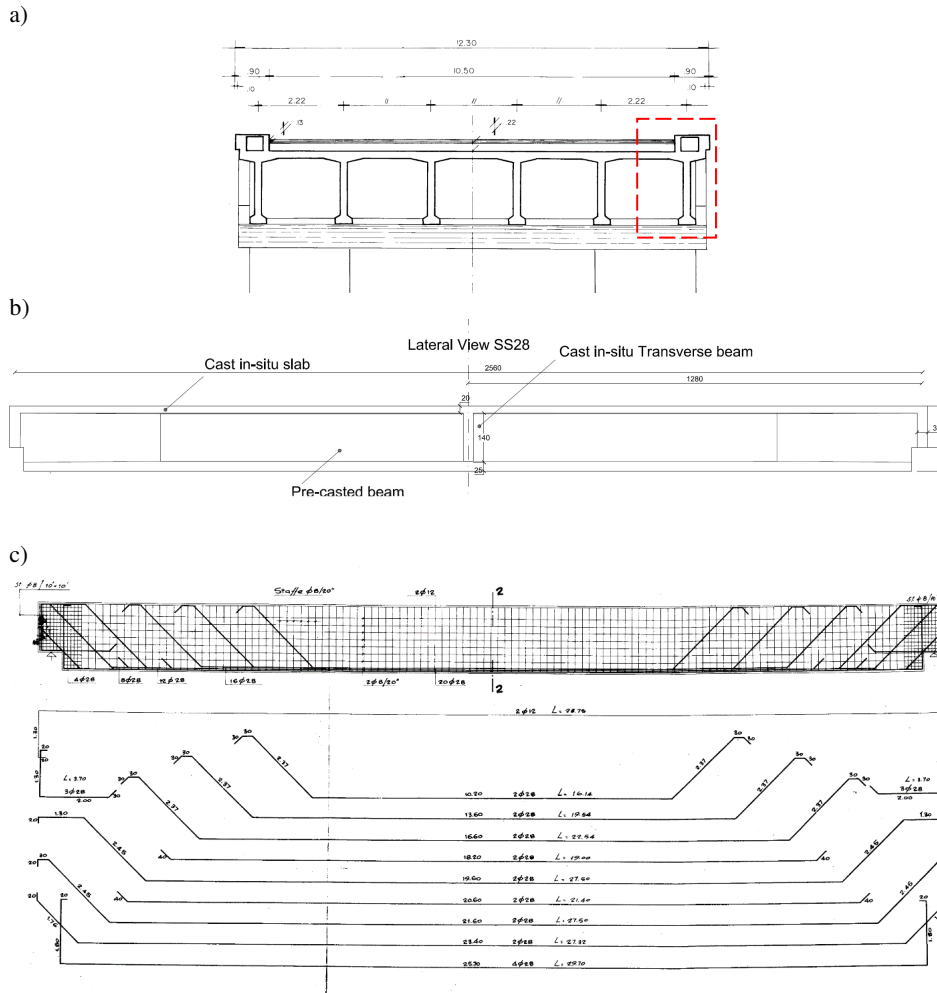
Main features of the RC bridge beam of the Mollere viaduct: a) cross section of the deck and selected edge beam (measures in m); b) lateral view of the beam after the longitudinal cut (measures in cm); c) detail of the main reinforcement of the precast RC beam.
